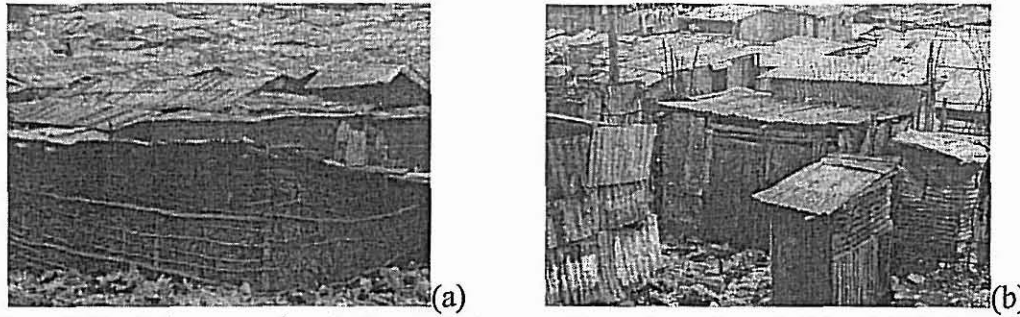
Typical constructions in Kenyan informal settlements: earth walls (a) and GCI sheets (b).
